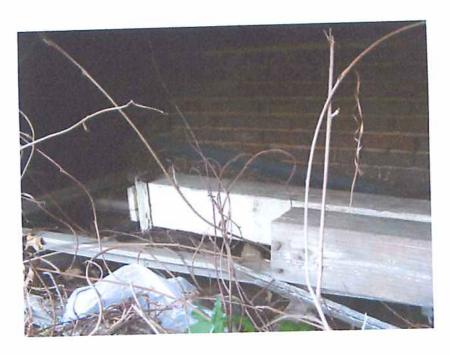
Structure #2234 - Deteriorate Exterior Face of Existing Brick
